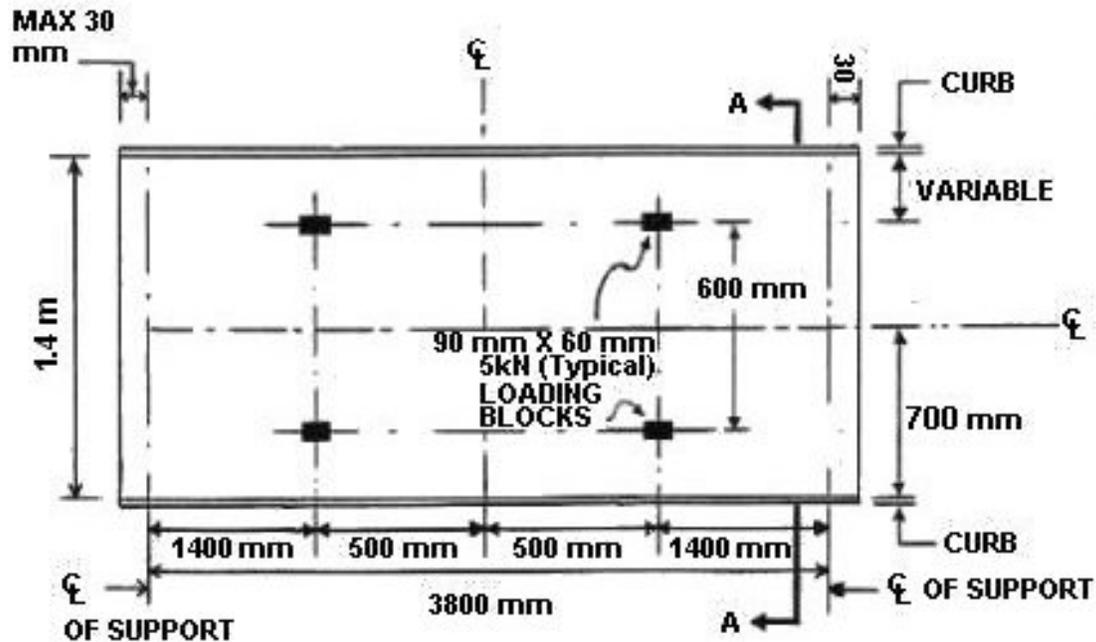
Plan View of Bridge Dimensions with Loading Setup
